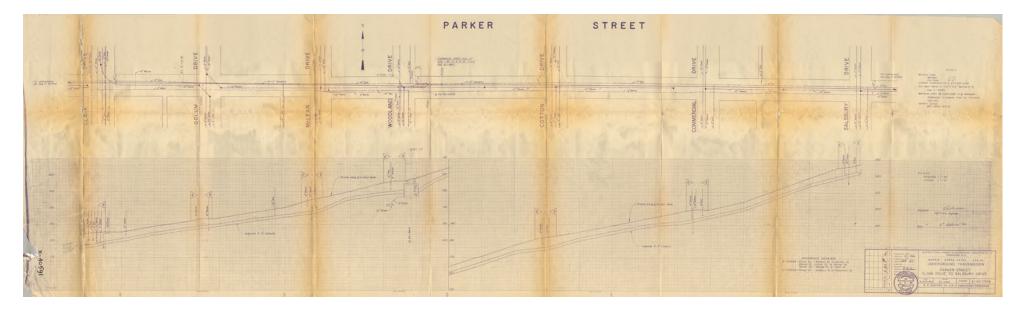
Parker Street BC Hydro R.O.W. as built drawings
